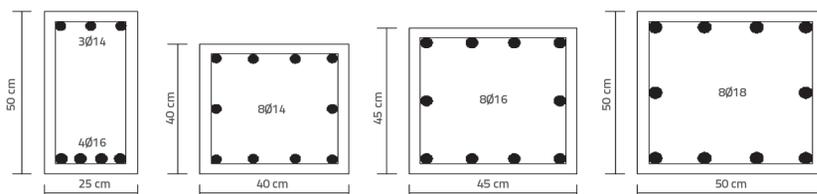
Section details of the beams (25x50) and columns (40x40, 45x45, 50x50)
